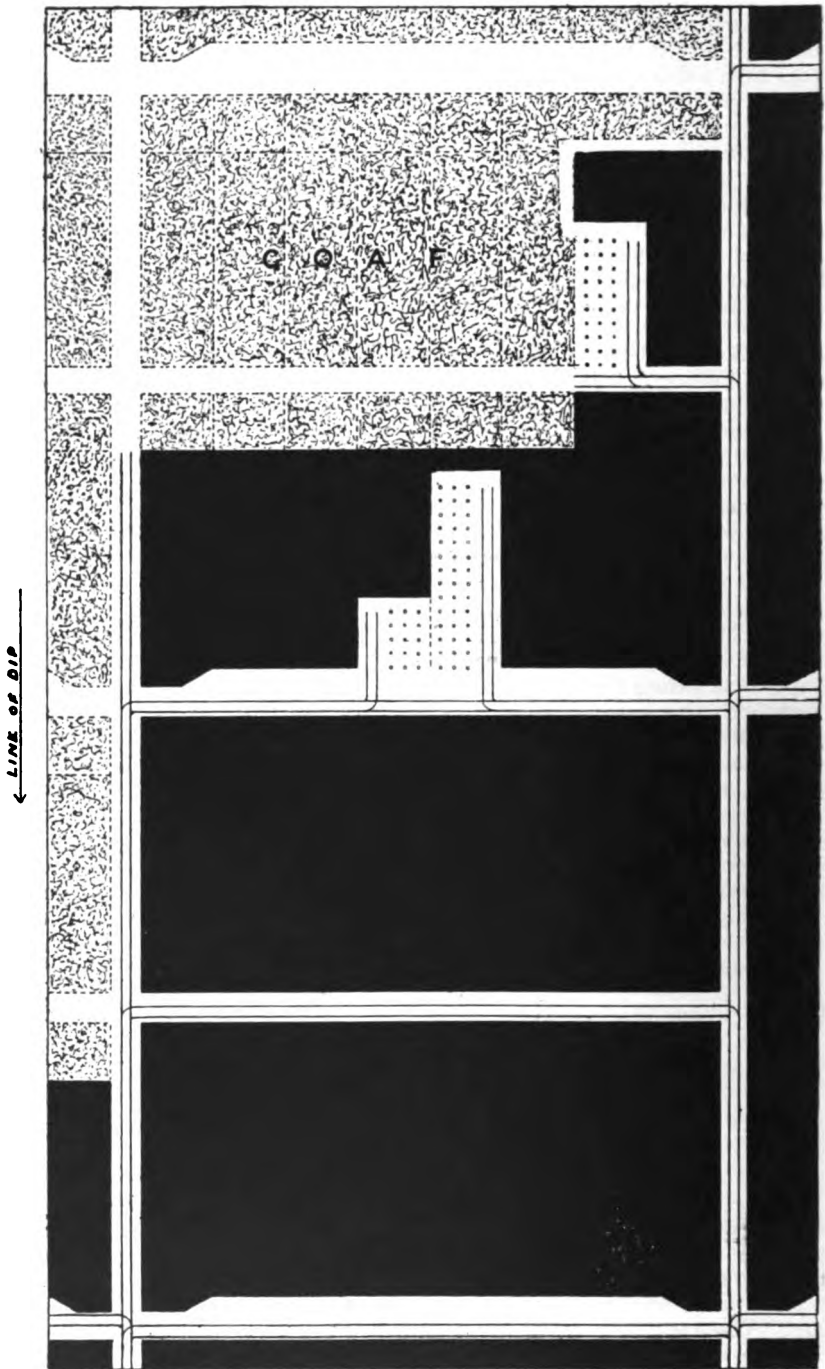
SILKSWORTH COLLIERY, NEAR SUNDERLAND, SOUTH DURHAM. PLAN SHOWING THE USUAL METHOD OF PILLAR WORKING IN THE MAUDLIN SEAM
